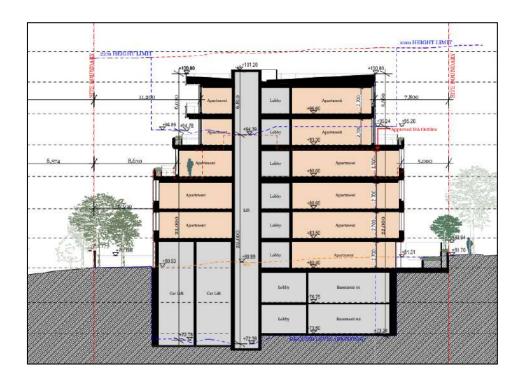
Calculation of Building Height Based on Existing (Excavated Levels)
